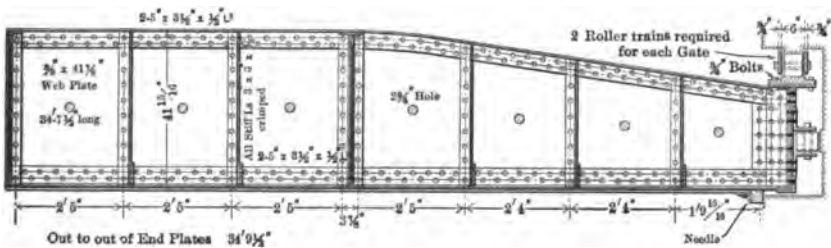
Half Plan, Sluice Gate, Laguna Weir, Colorado River, California.
